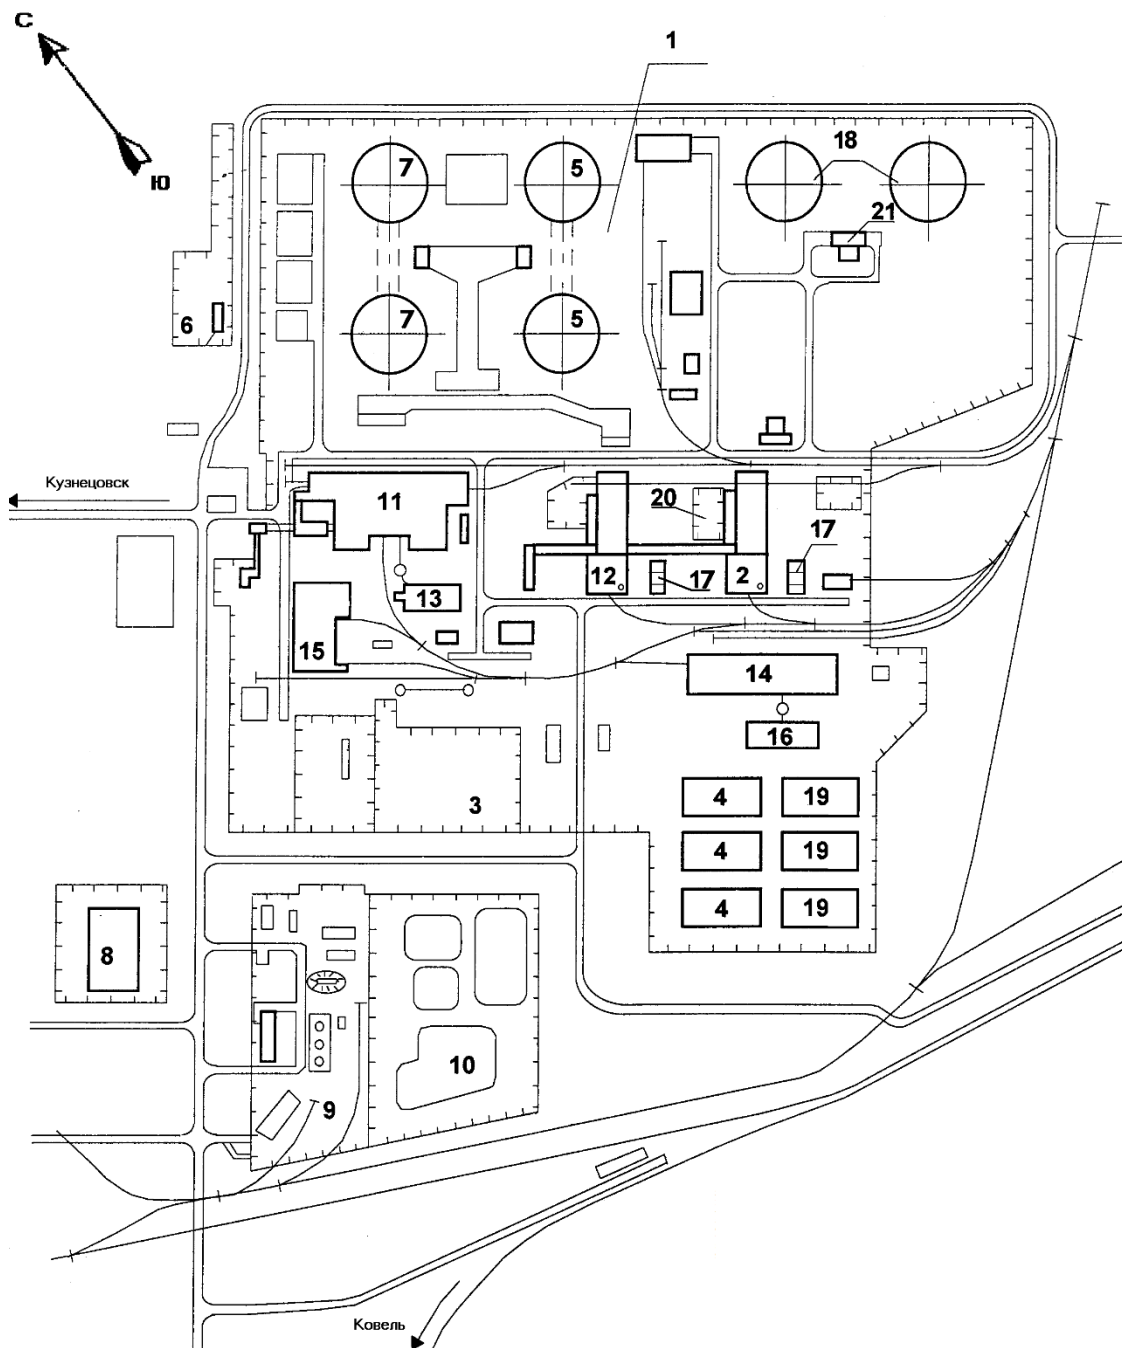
Schematic layout of buildings and structures at the SS Rivne NPP industrial site
